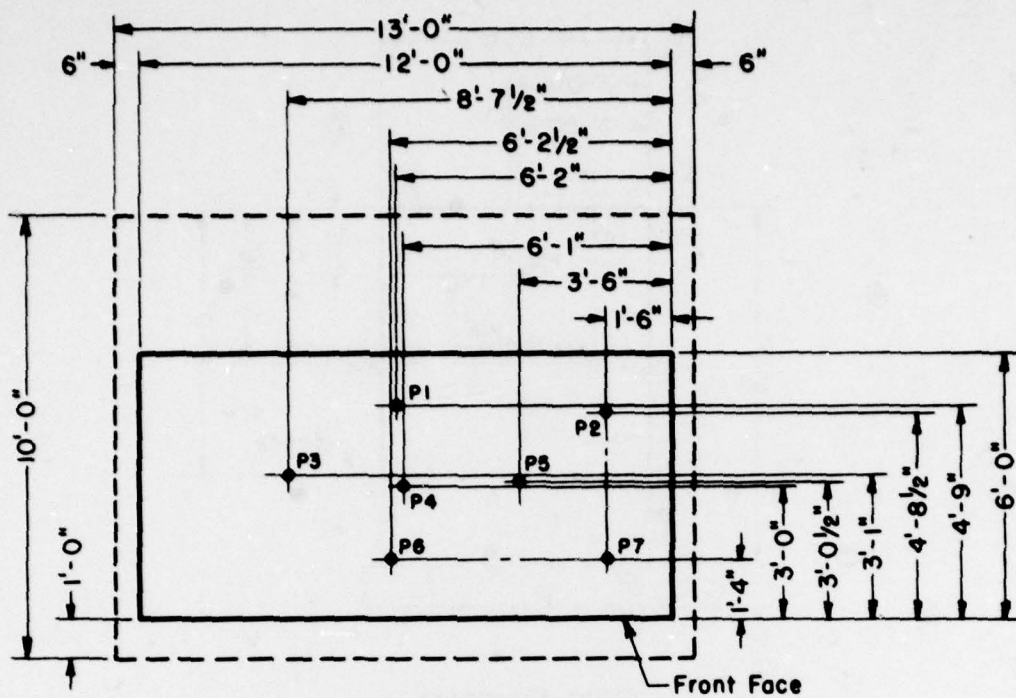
Structure 3.1s, plan view and front elevations.
